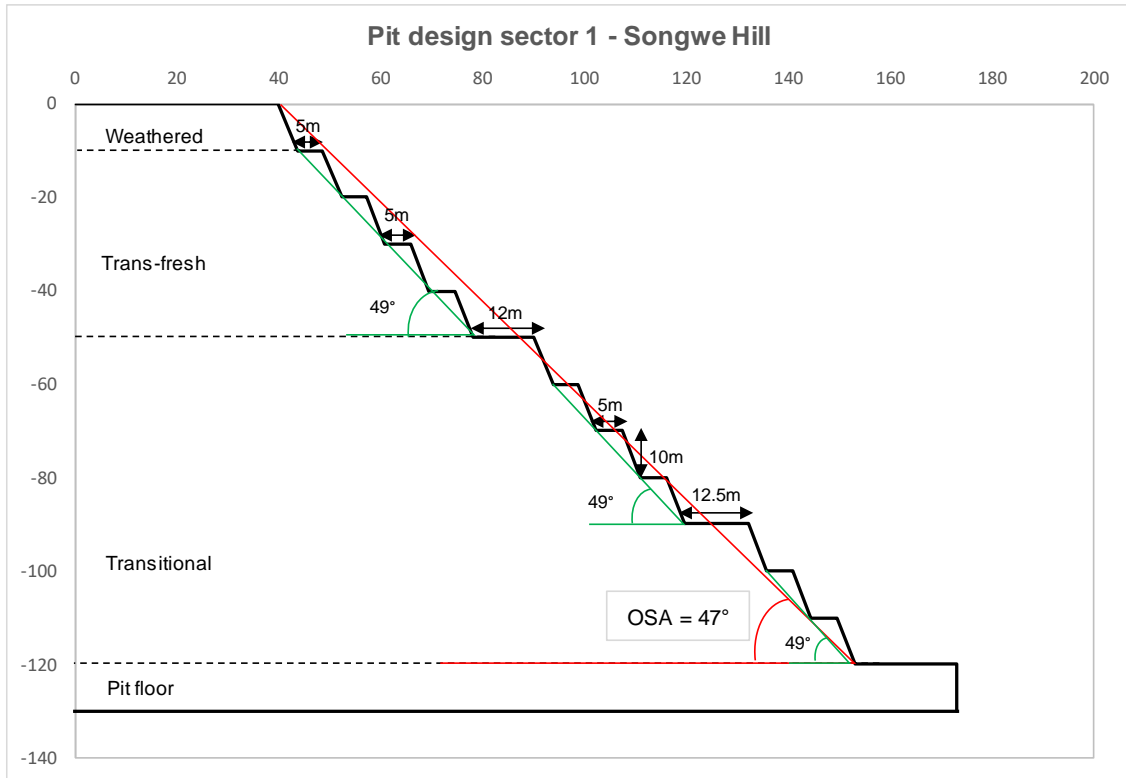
Diagram Showing Slope Geometry for Sector 1
